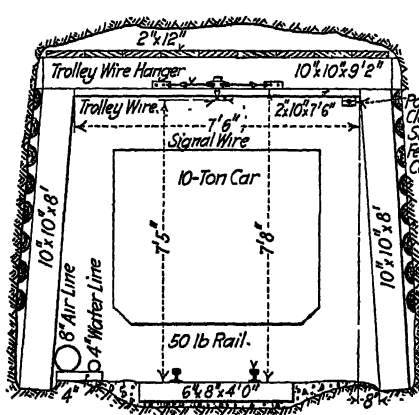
CROSS-SECTION OF TIMBERED TUNNEL.
